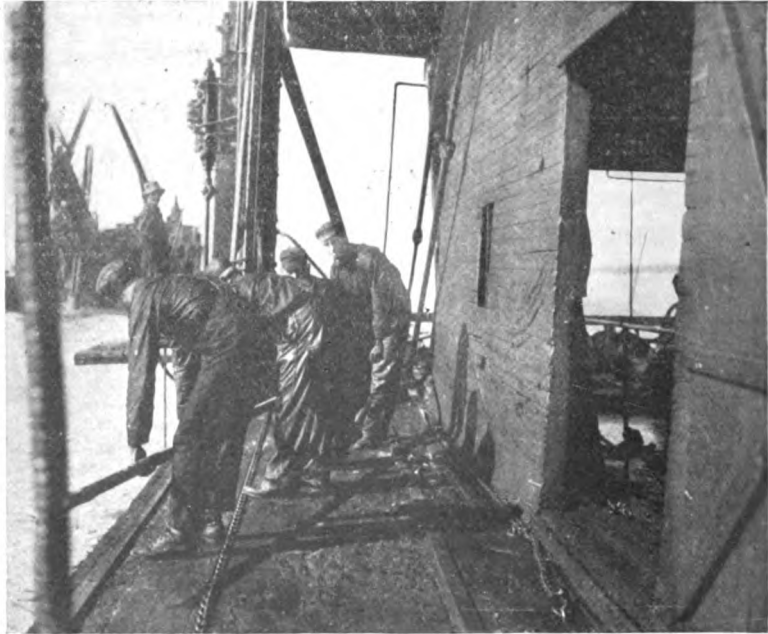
Handling Steels on Drill Boat "Exploder."
